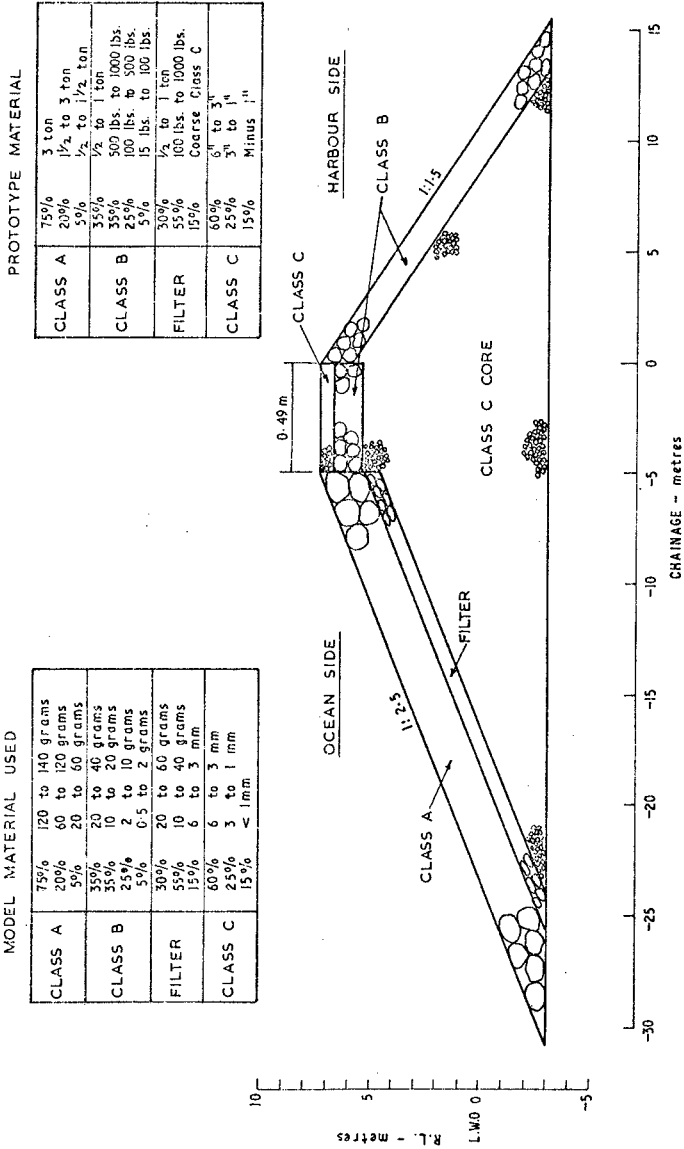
TYPICAL CROSS SECTION OF BREAKWATER
